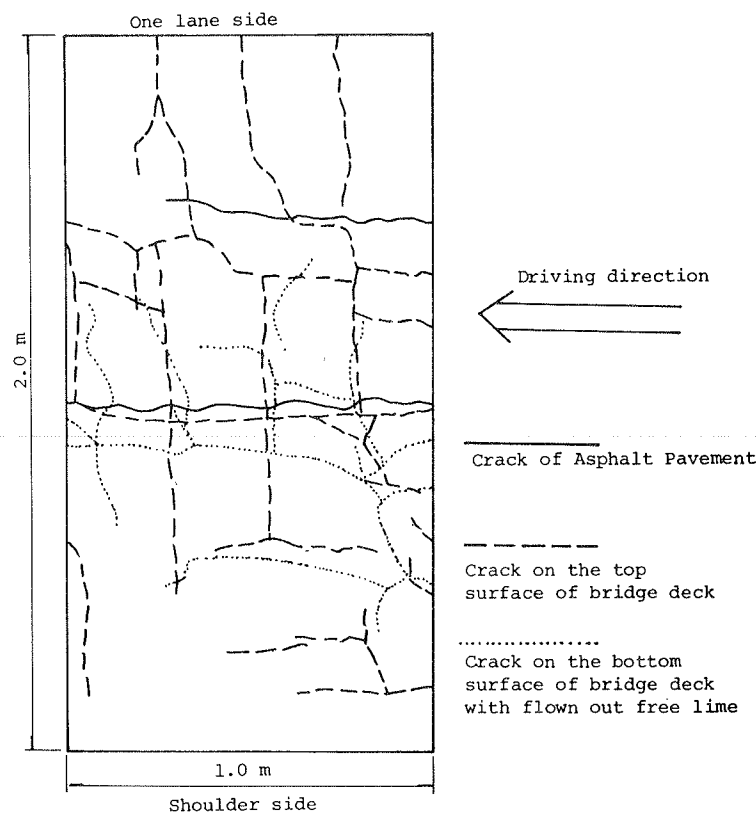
Typical crack pattern of deteriorated bridge deck in service.
